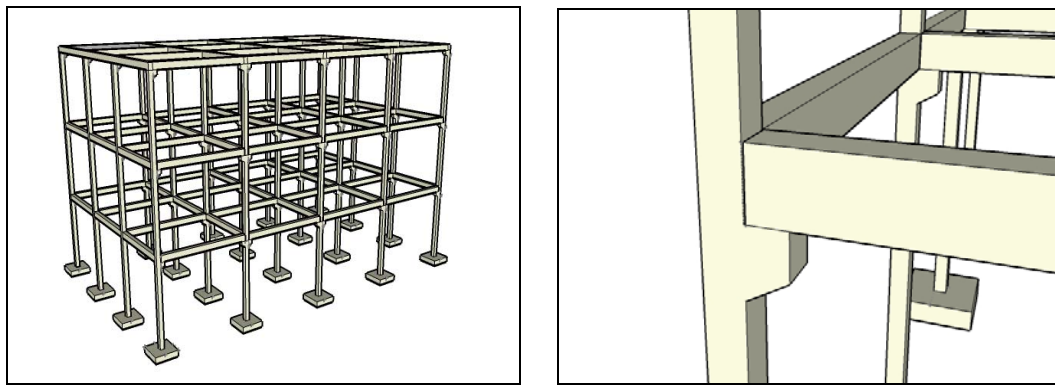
The application of simple beam-to-column connections in precast concrete skeletal frame.
